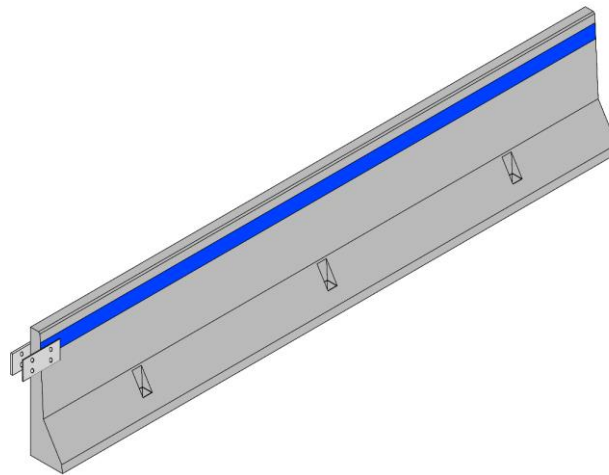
3D rendering of the “NDBA Tunnel” concrete safety barrier
